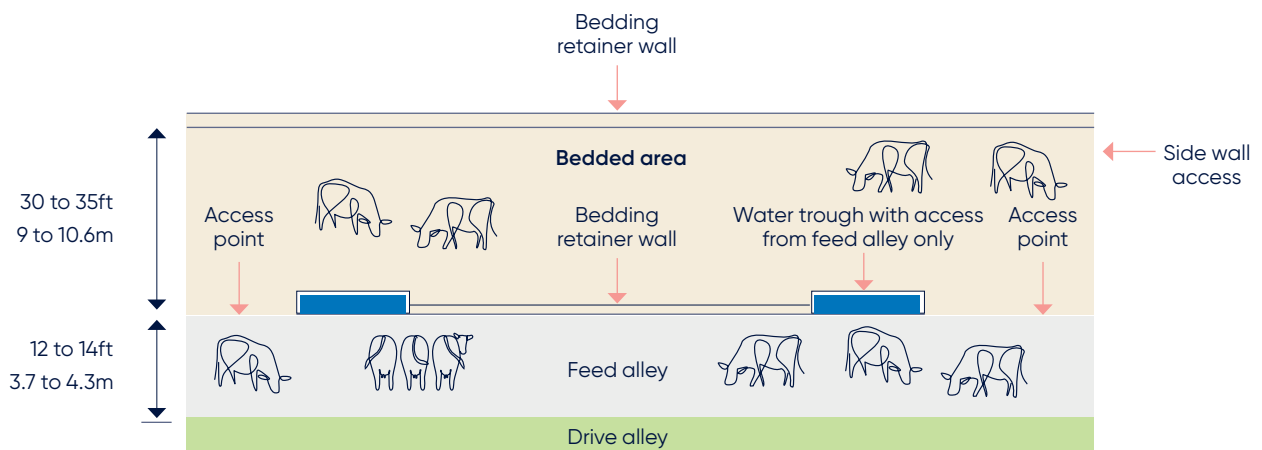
Concrete retaining walls provide separation between the feed alley and the bedded pack area which is helpful in managing pack moisture
